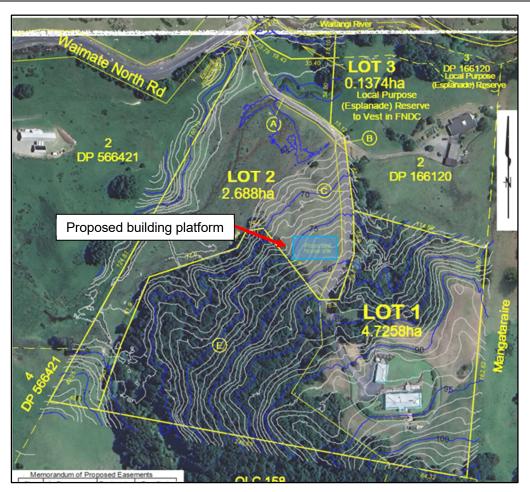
Proposed subdivision plan (Williams and King Ltd).
